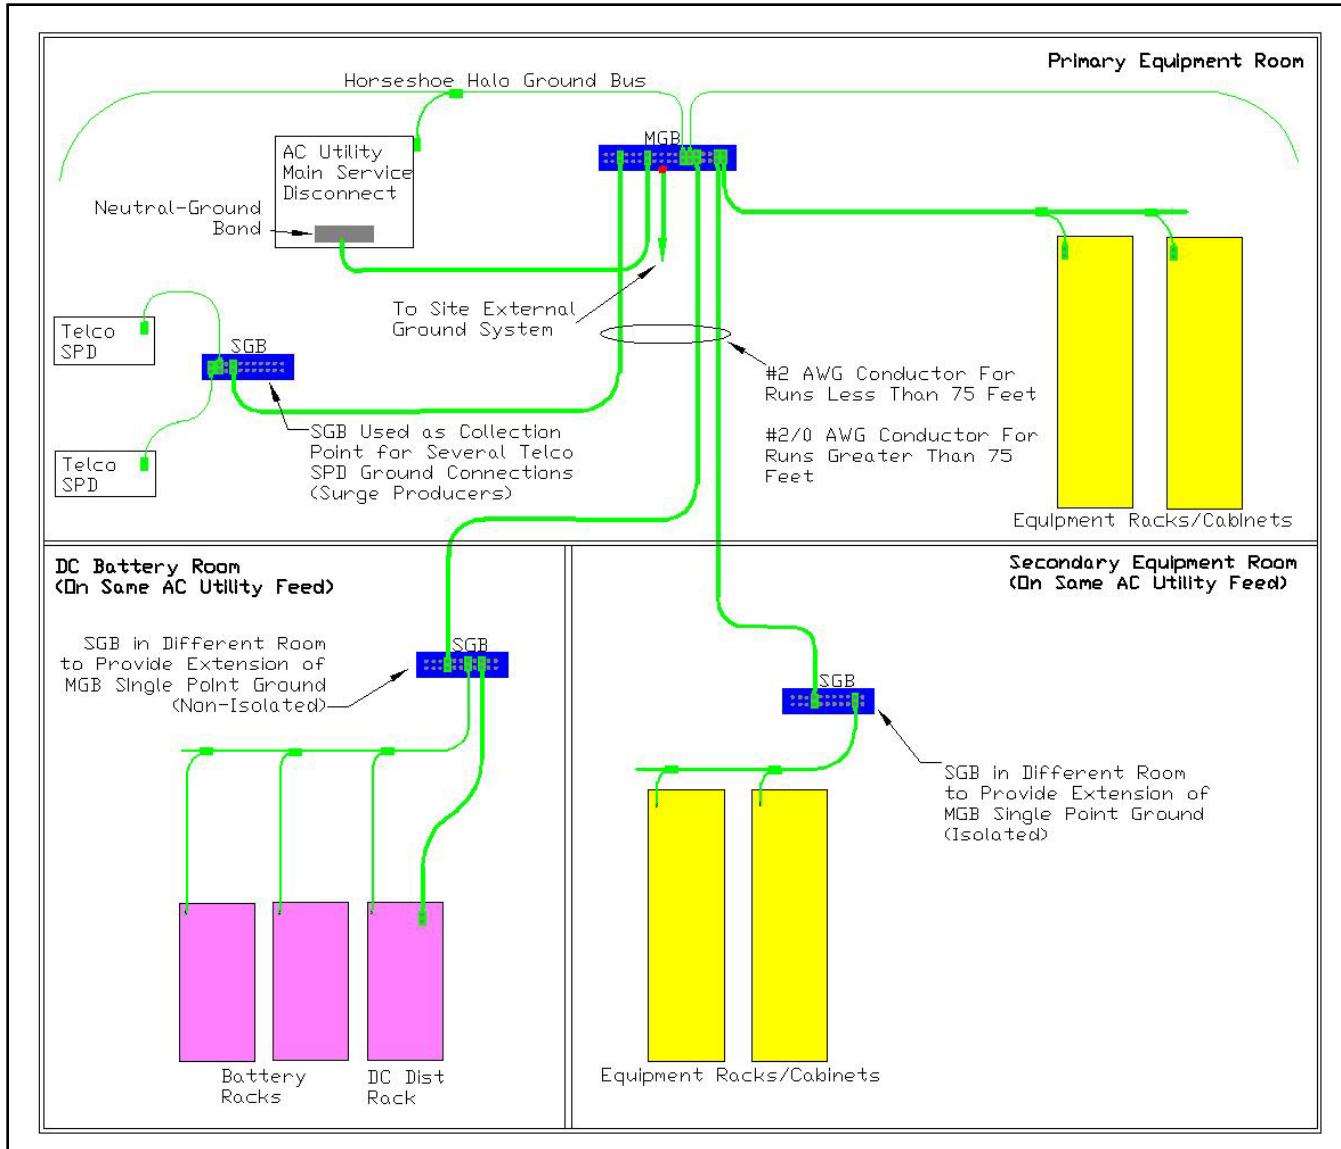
Typical Connections Made to MGB at RF Site
